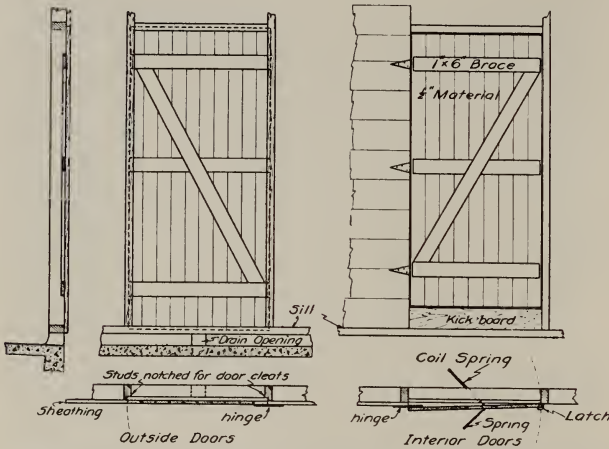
Plan for the construction of outside doors and of double-swing inside doors for a poultry house. See J, Fig. 22.
